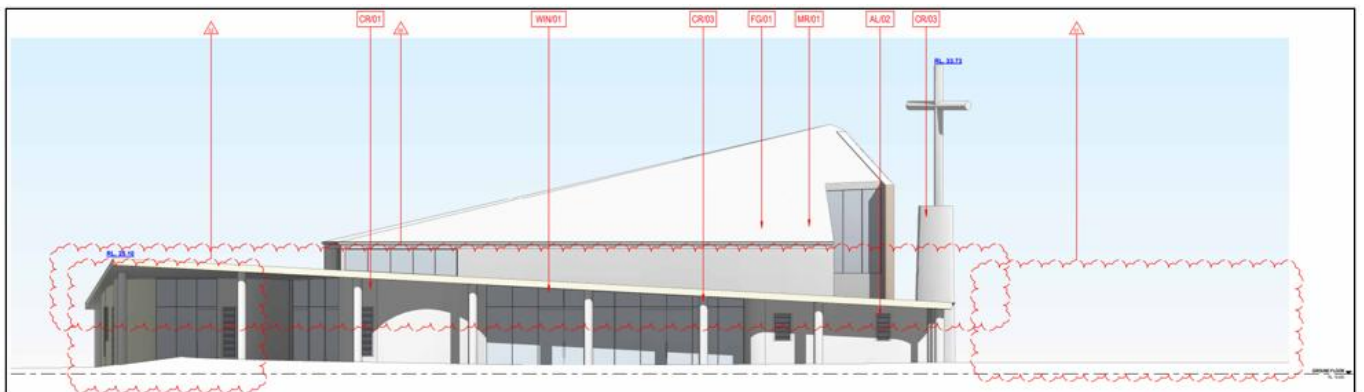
| Proposed changes to external façade and roof features (Source: Applicant’s Modification Application, 2026)
